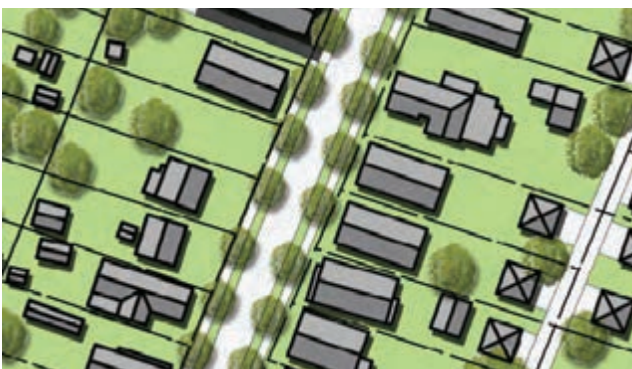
Proposed Carriage Homes on Alley Loaded Single-Family Lots - Plan and Image
